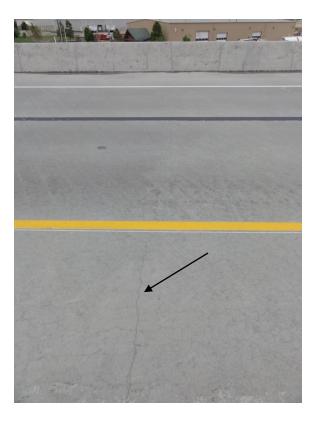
Reflection cracking from half-deck concrete panels in Dannon Way northbound internally cured concrete deck at 1 year.
